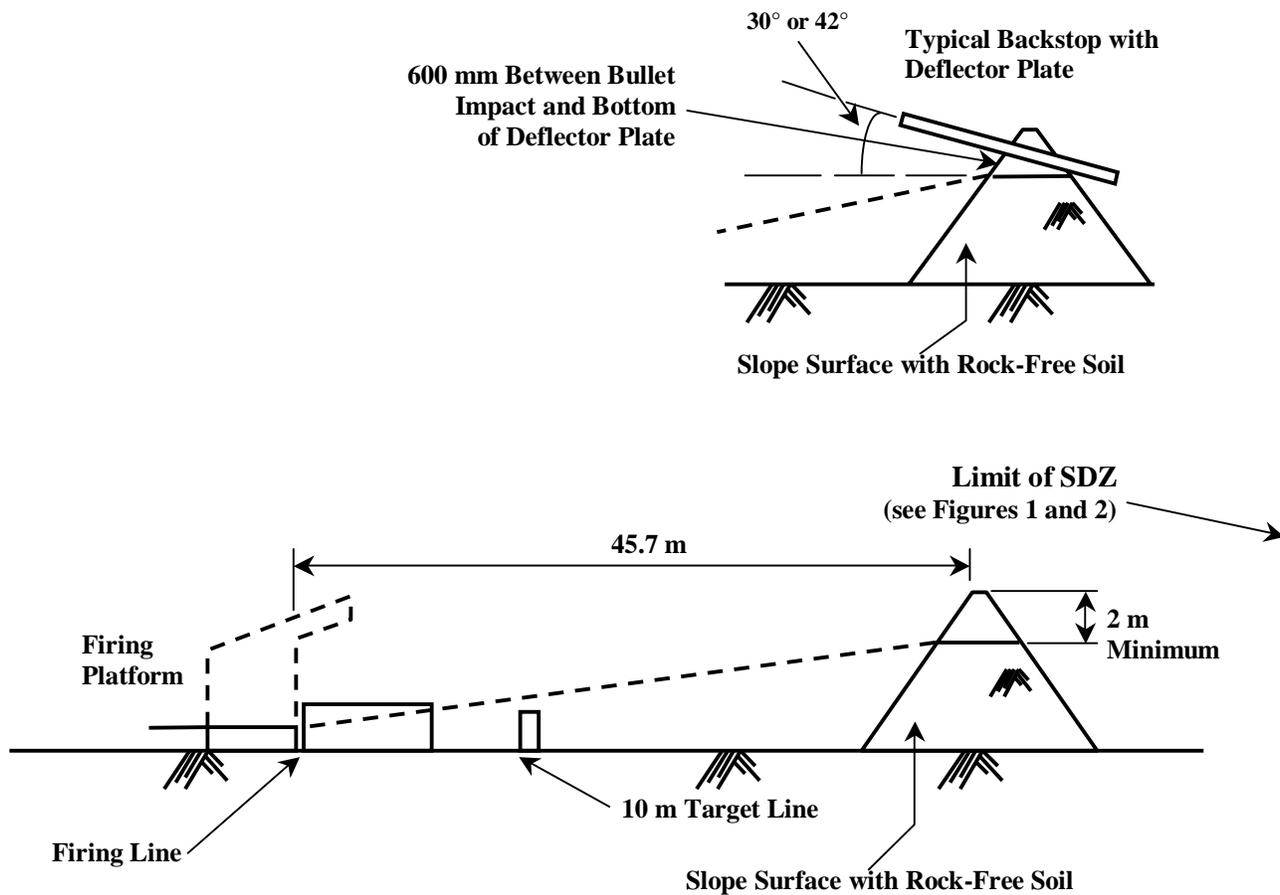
M60 Machine Gun, 10-Meter Tube Range Typical Cross-Section
